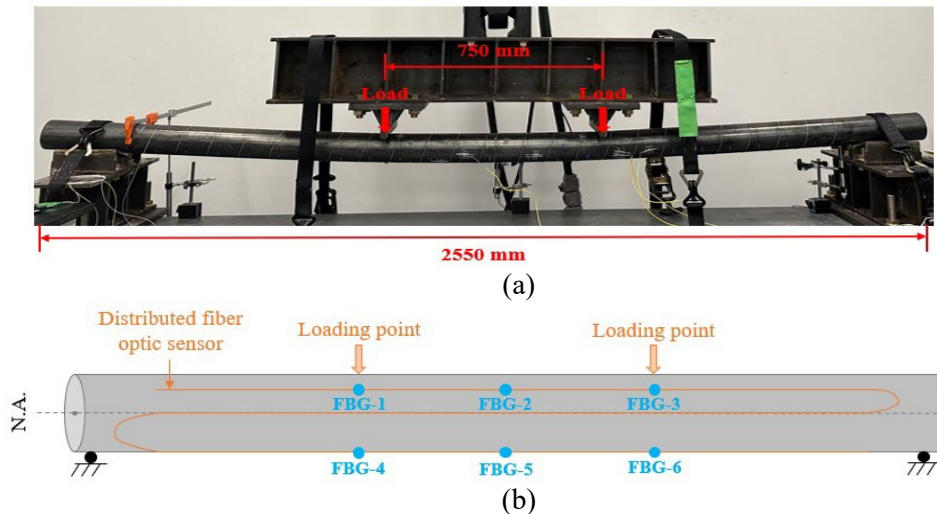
Experimental test set-up: (a) photograph of the four-point bending test; (b) deployment of FBG sensors on the pipe-elevation view.
